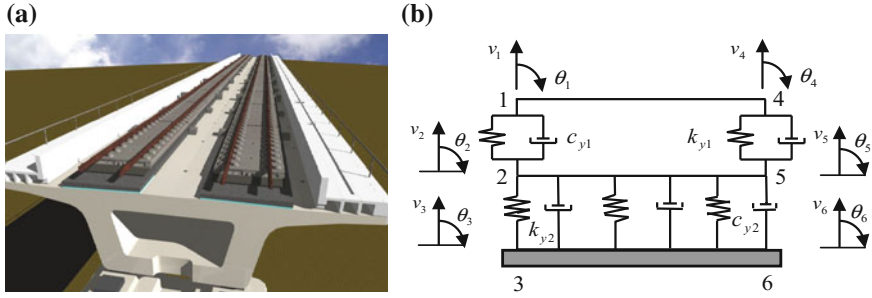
Three-layer slab track-bridge element model. a Cross-sectional diagram of elevated slab track and b three-layer slab track and bridge element
